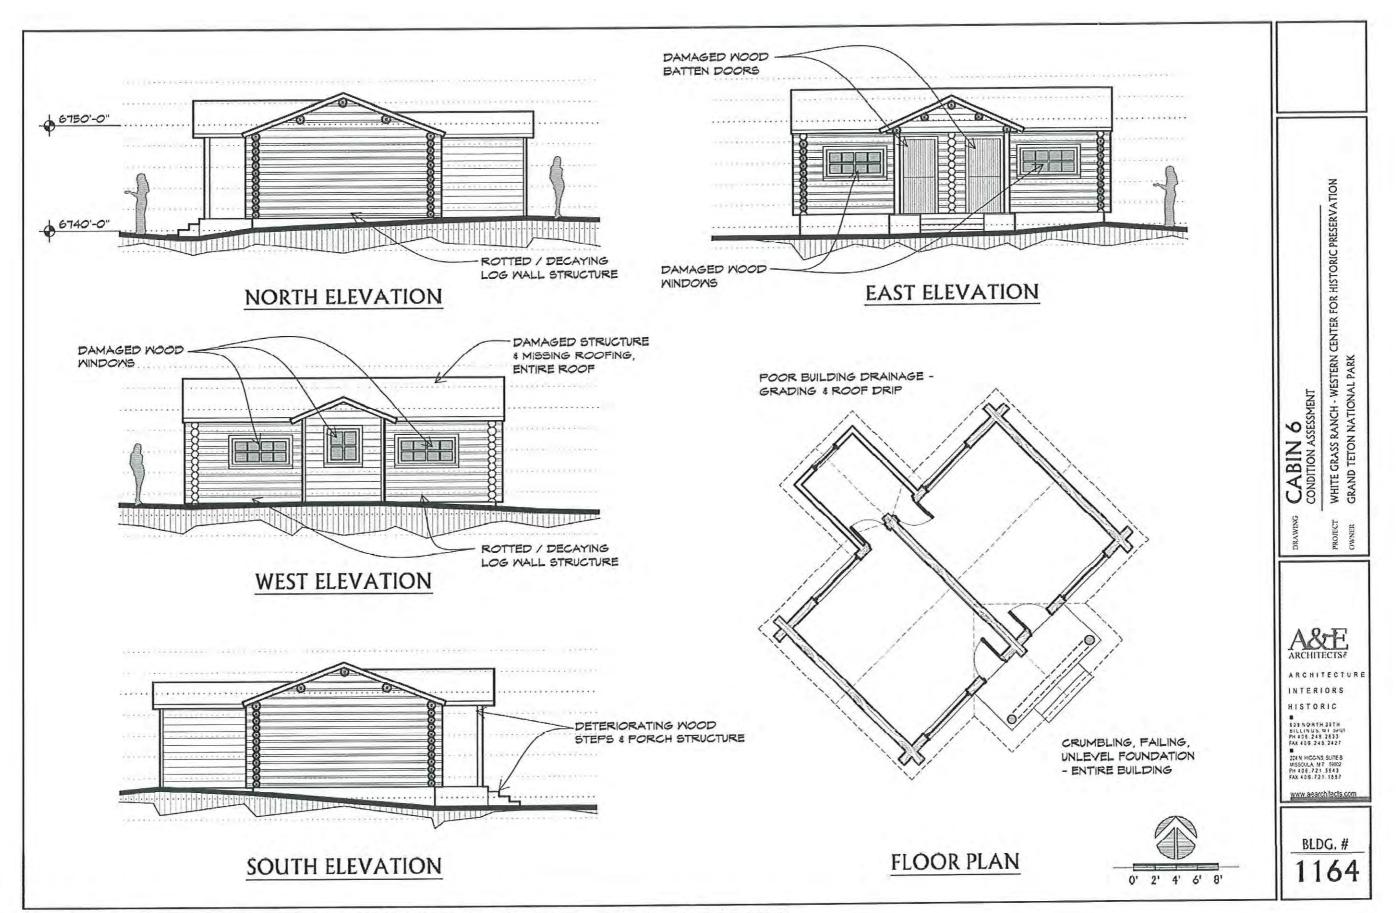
Existing conditions plan and elevations for HS-1164, Cabin 6, showing areas of deterioration (A&E: 2006).
